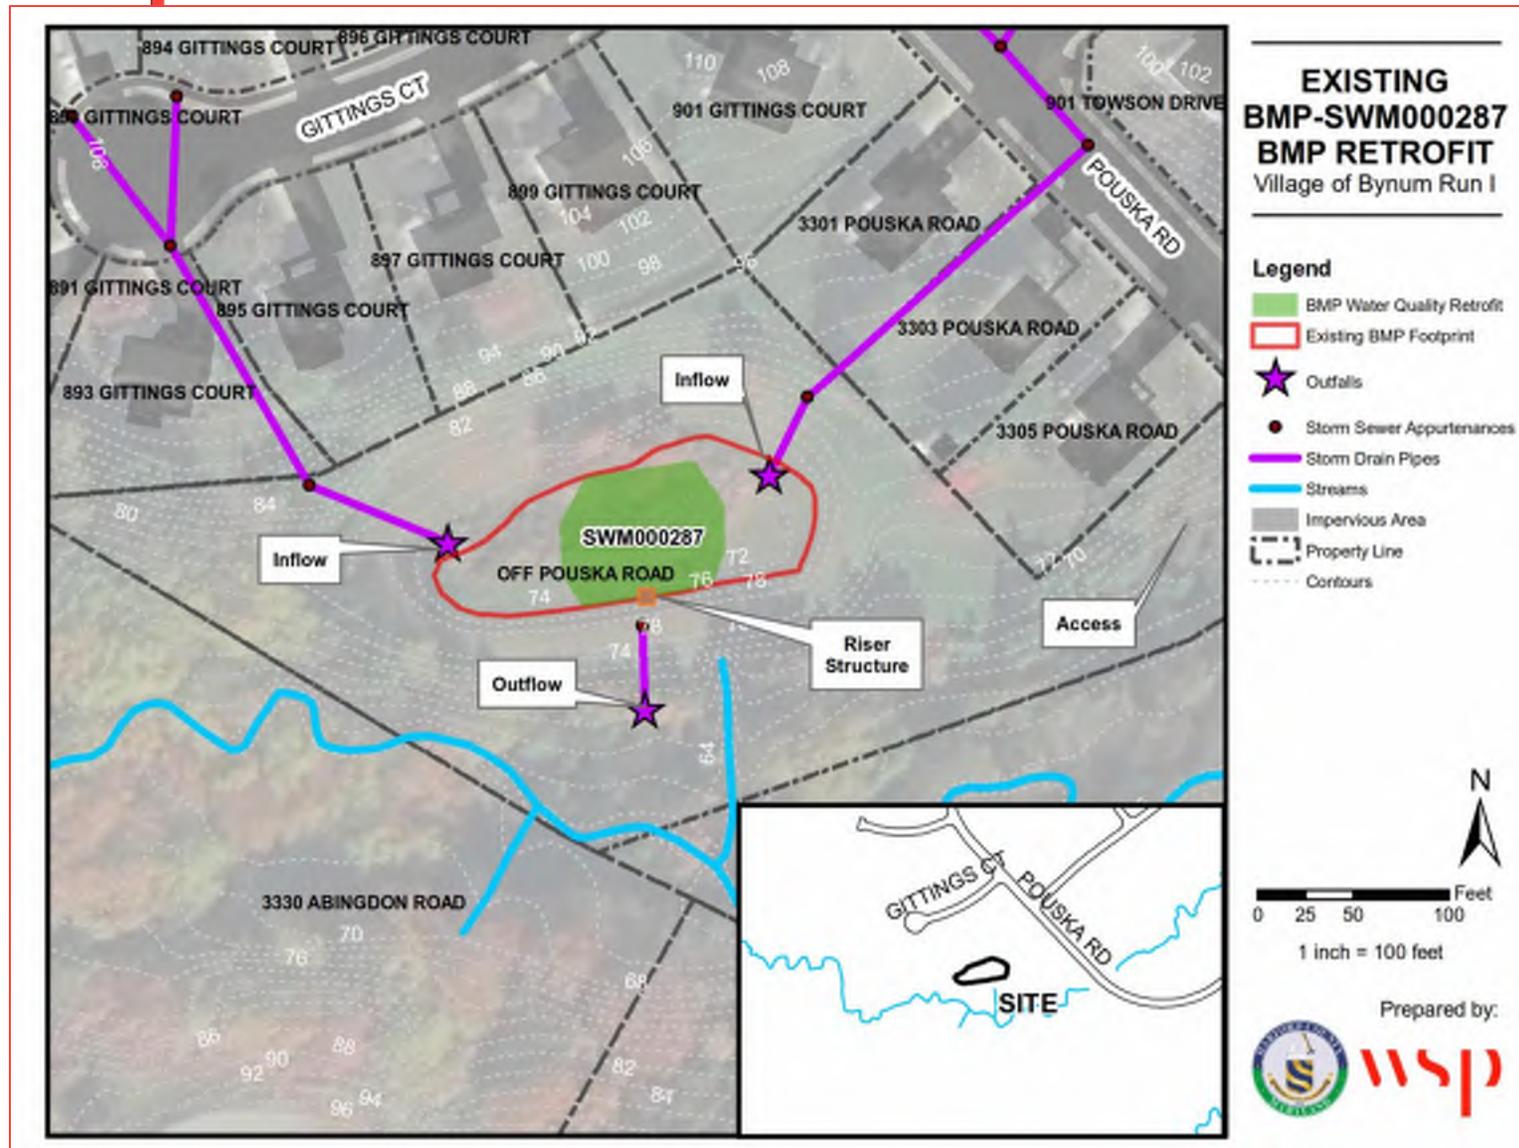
Site Location and Proposed Retrofit for Existing BMP-SWM000287
